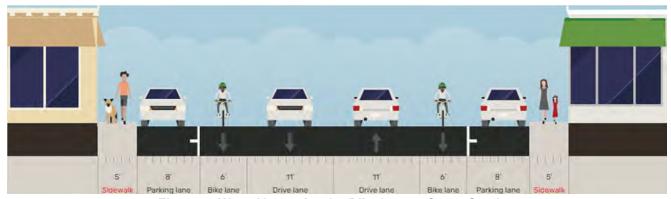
West Alternative 1 – Bike Lanes, Cross Section
